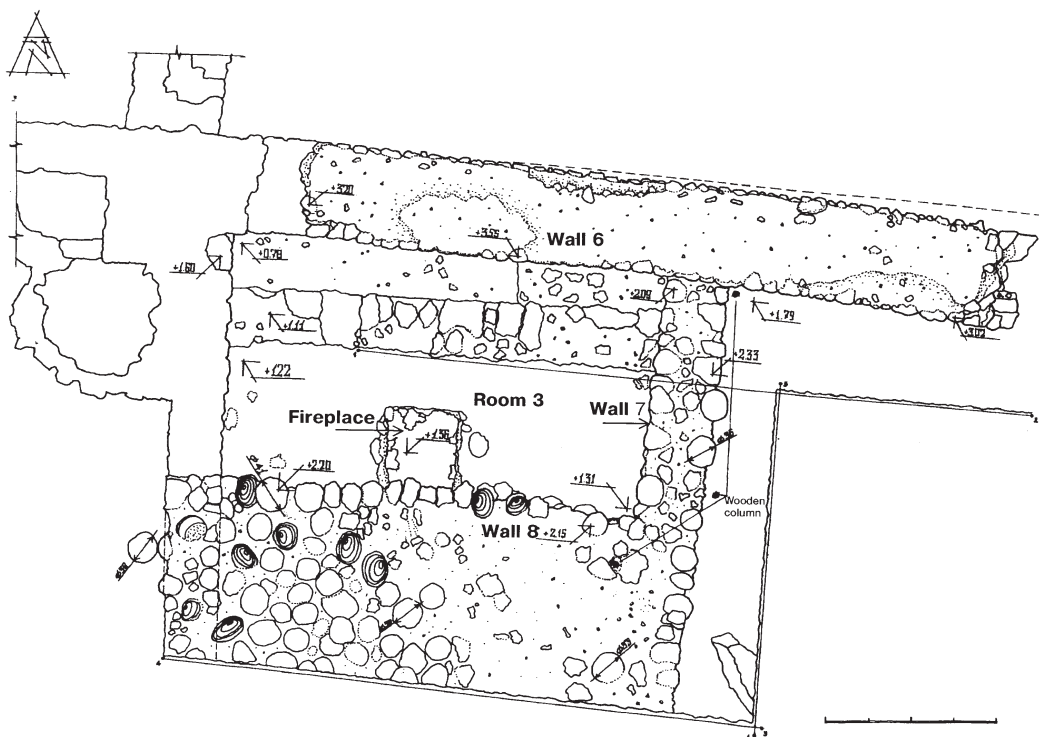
Room No. 3 on the site for the trebuchet. Plan
